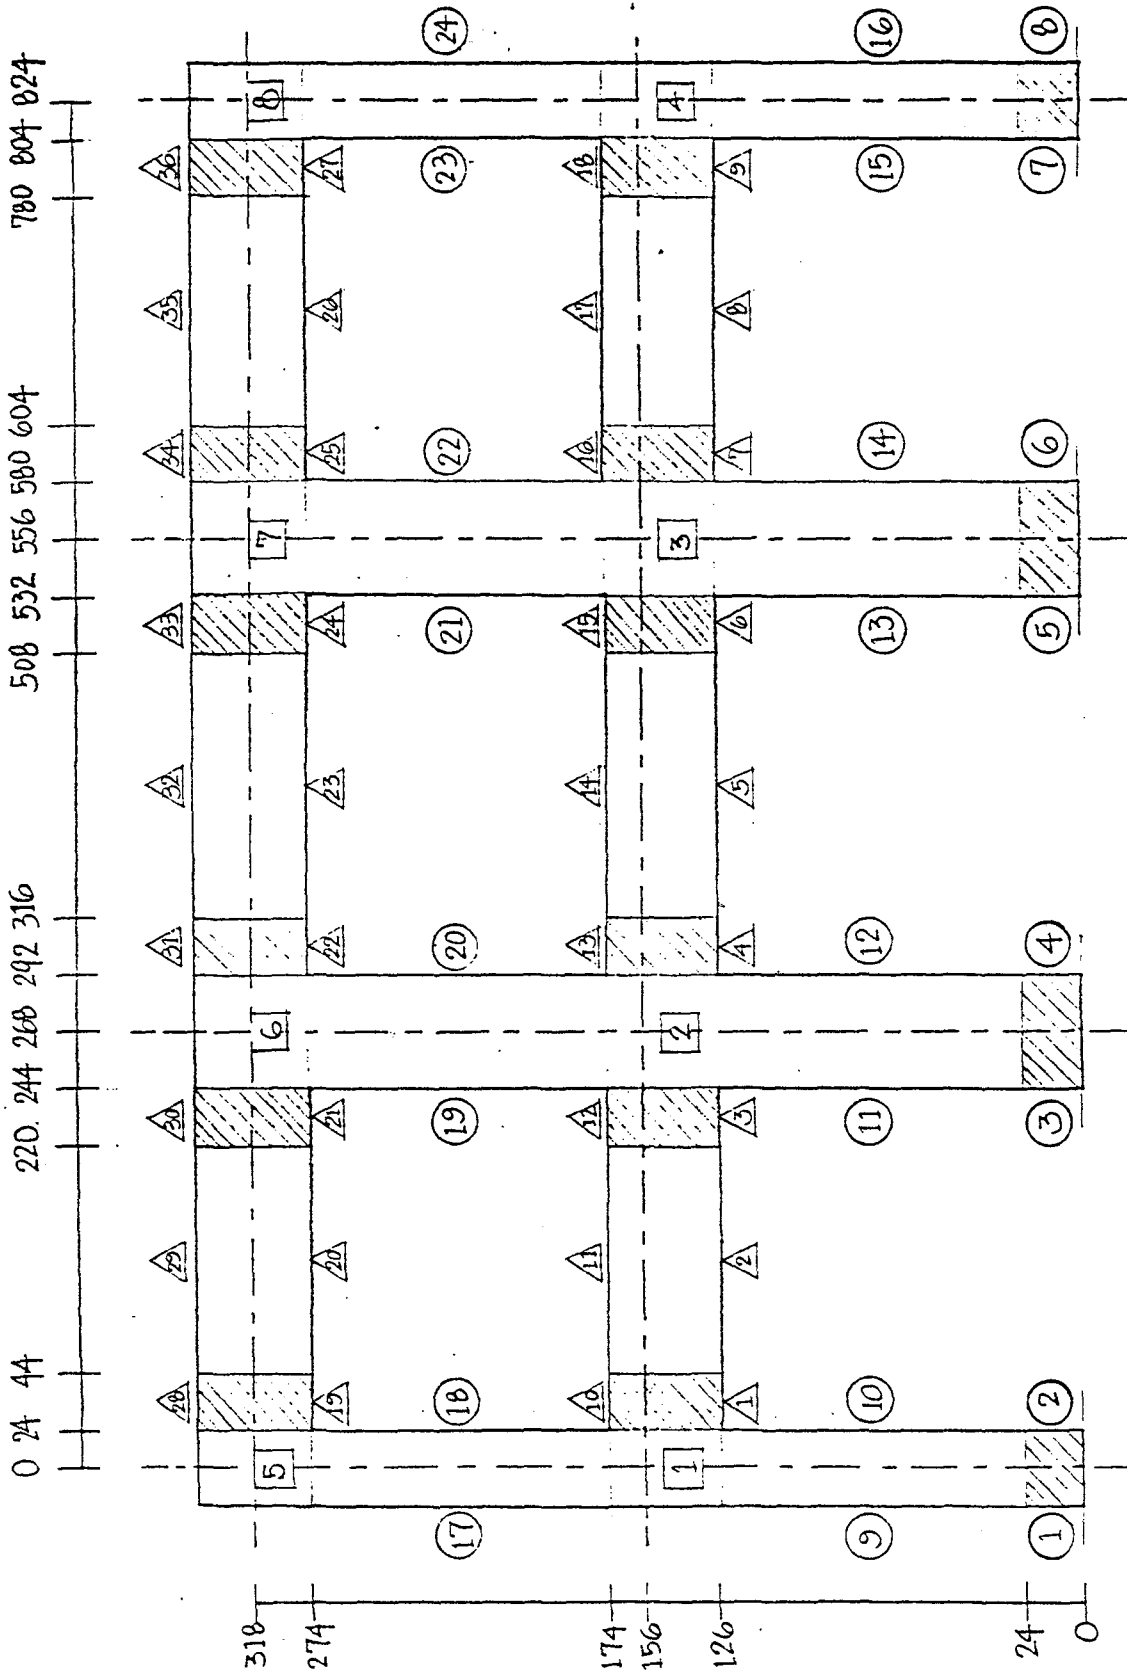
shows the structural idealization of the wall frame using the SCM approach where three types of elements, viz. beam, column and panel elements are utilized to model the structure. It can be seen from this figure that the beams and columns are represented by two identical elements in order to satisfy the compatibility requirement at the corners of the panel element. The SCM model for a nonlinear analysis requires a knowledge of the locations where the inelastic action is expected. We first assumed that plastic hinges may form in all members in the structure. Then, we reviewed the responses to determine whether or not the member has yielded at the locations we selected. After a few cycles of iteration, it was determined that the plastic hinges formed at the beam ends and at the base of columns as indicated by the shaded zones shown in Figure 7-1. The plastic hinge length is assumed to be one-half of the section depth. The inelastic elements were then chosen to model the plastic hinge and the corresponding nonlinear behavior was characterized by the moment curvature relation
